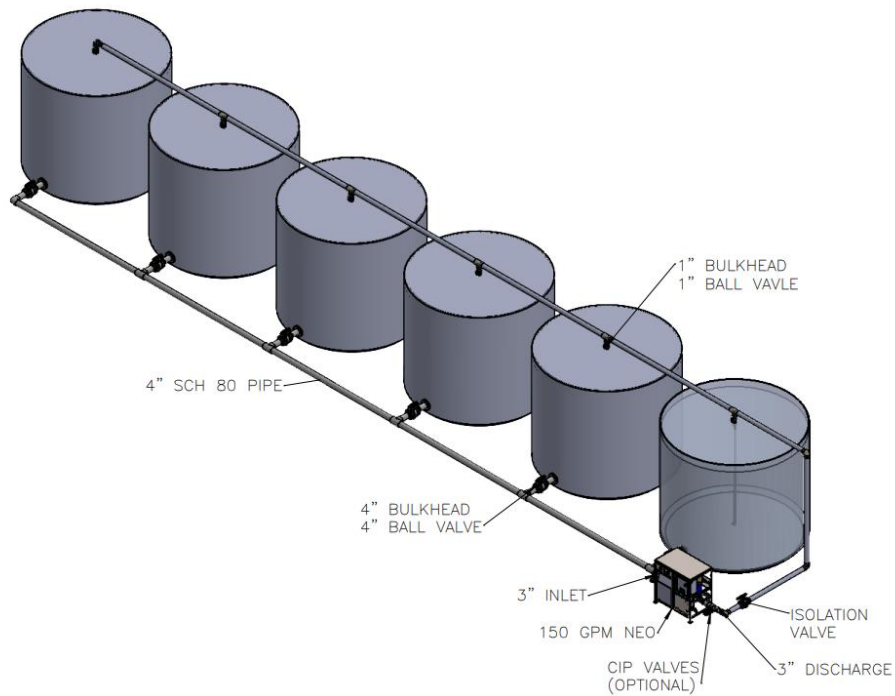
Isometric View of NEO suction and discharge layout in a multi-tank installation
